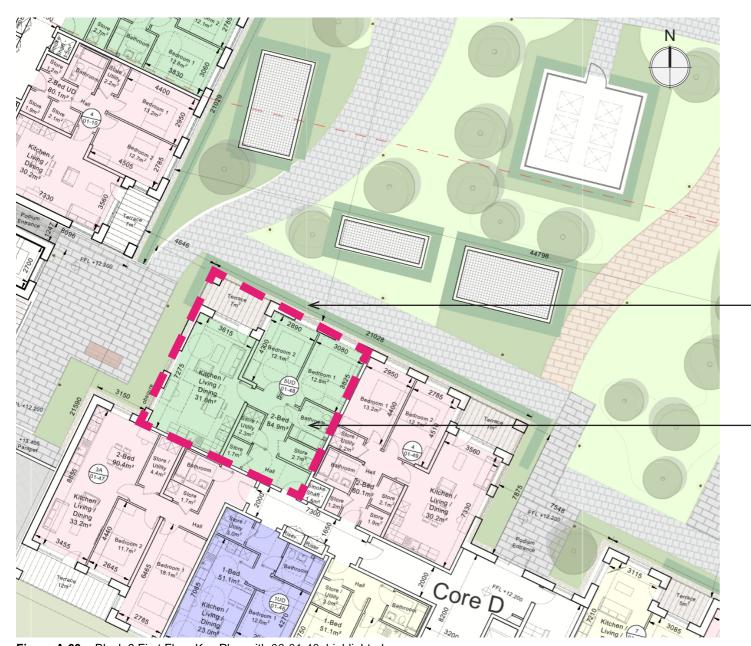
Block 6 First Floor Key Plan with 06-01-48, highlighted
